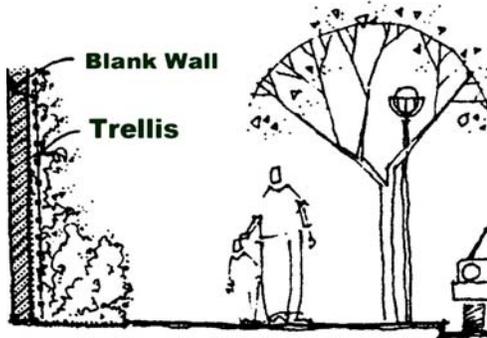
A planting bed and generous landscaping used to screen a blank wall.
